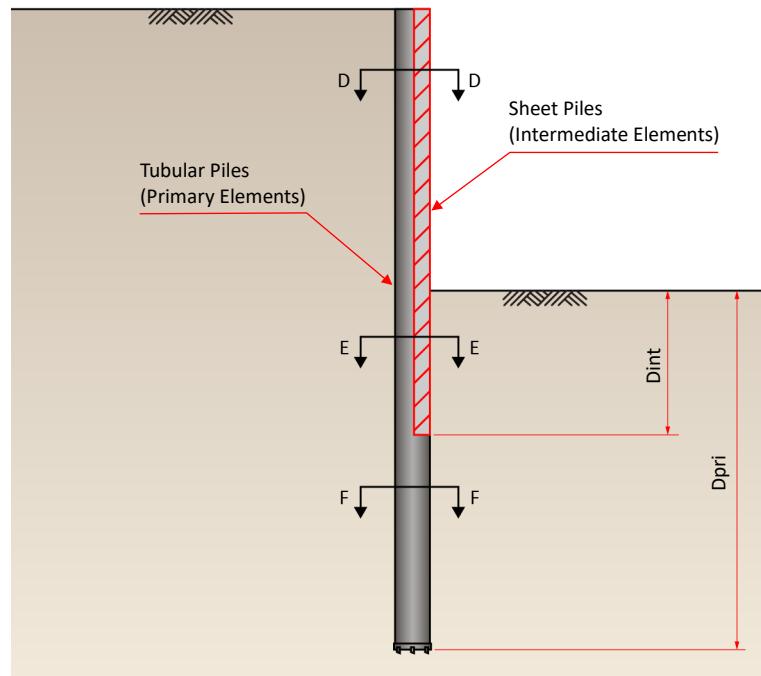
(a). Combi-Gyro Wall - Section (Pattern B)
